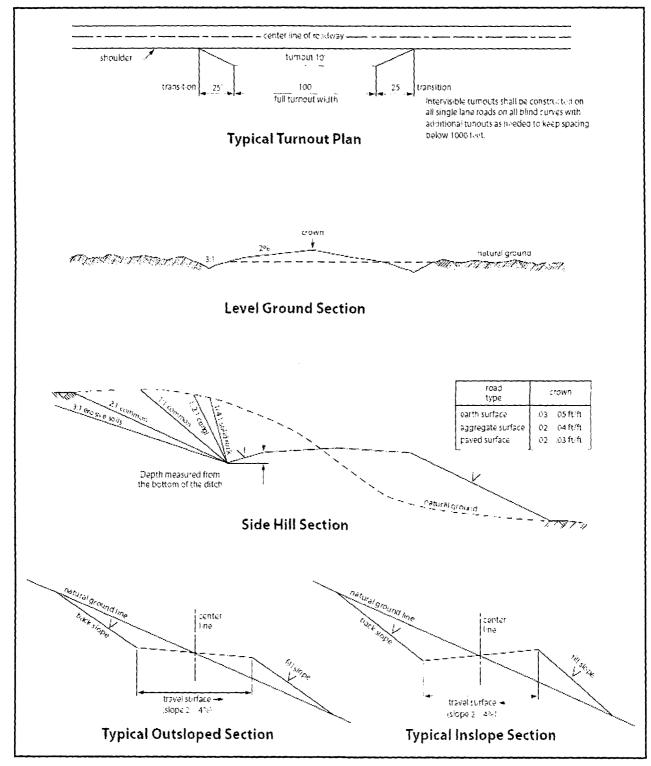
Cross-sections and plans for typical road sections representative of BLM resource or FS local and higher-class roads.
